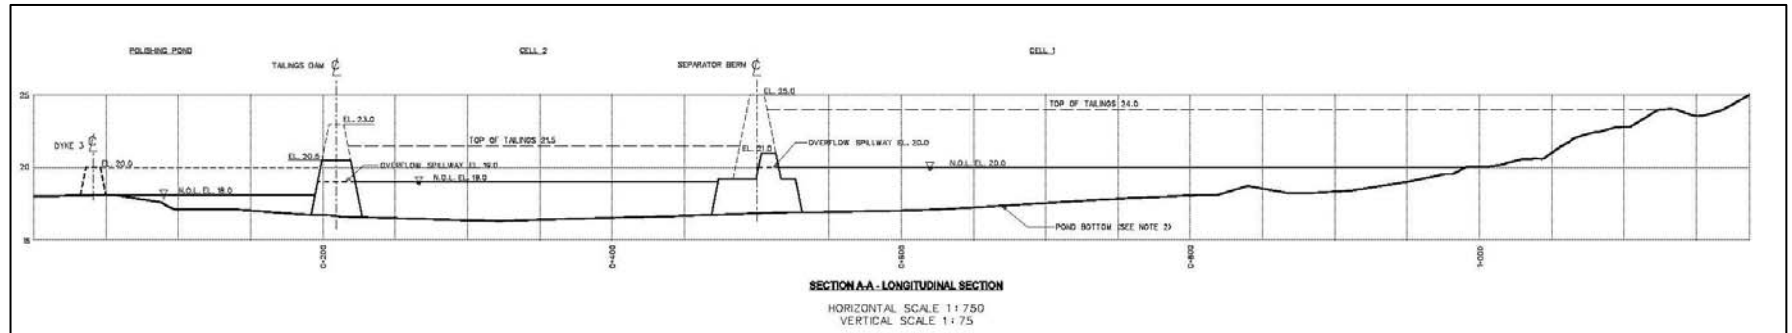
Tailings Management Facility – Cross Section Details
